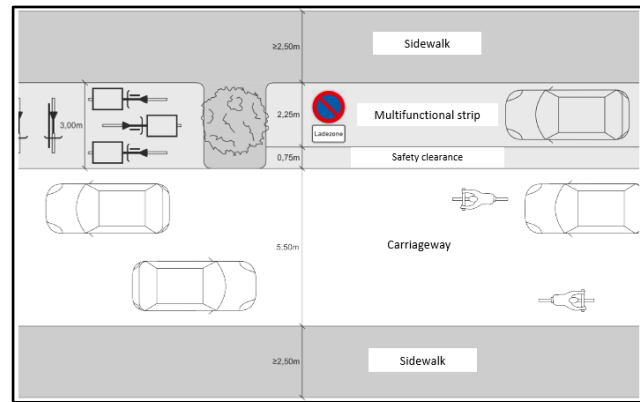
Requirement of safety clearance between parking and cycling in mixed traffic with and without advisory lanes according to the RAST fact sheet of R Climate (example, own photo, own illustration).
